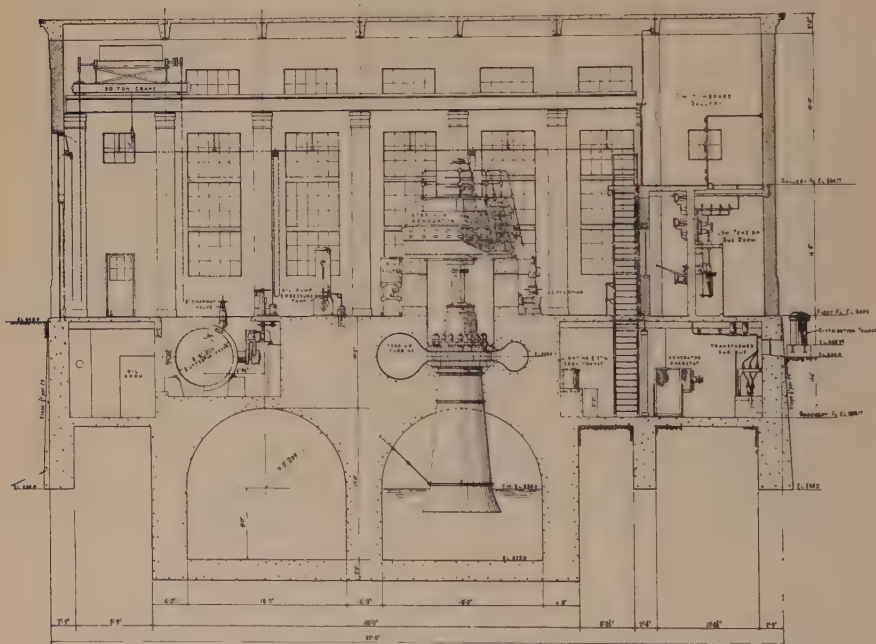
RIO DEVELOPMENT — LONGITUDINAL SECTION OF POWER HOUSE
